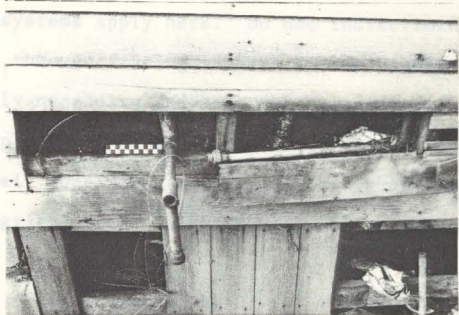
Deteriorated condition of the plumbing which runs through the south wall of the house.
